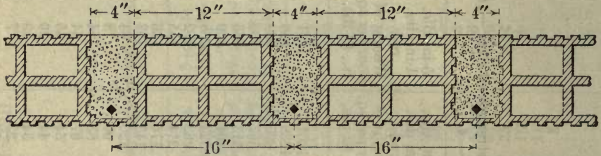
Combination Floor, Concrete Joists protected by Soffit Tile.
